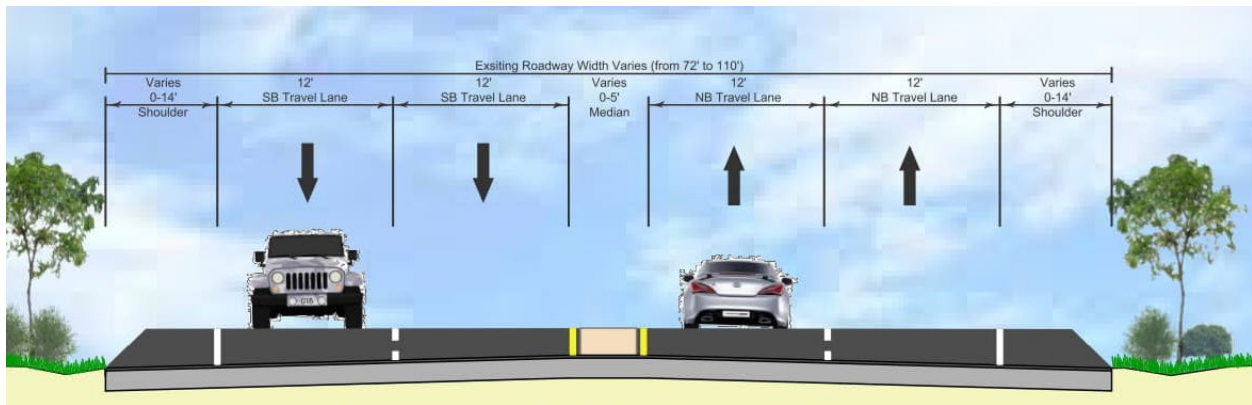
Existing Typical Section MD 272 Between MD 274 and Lums Road
